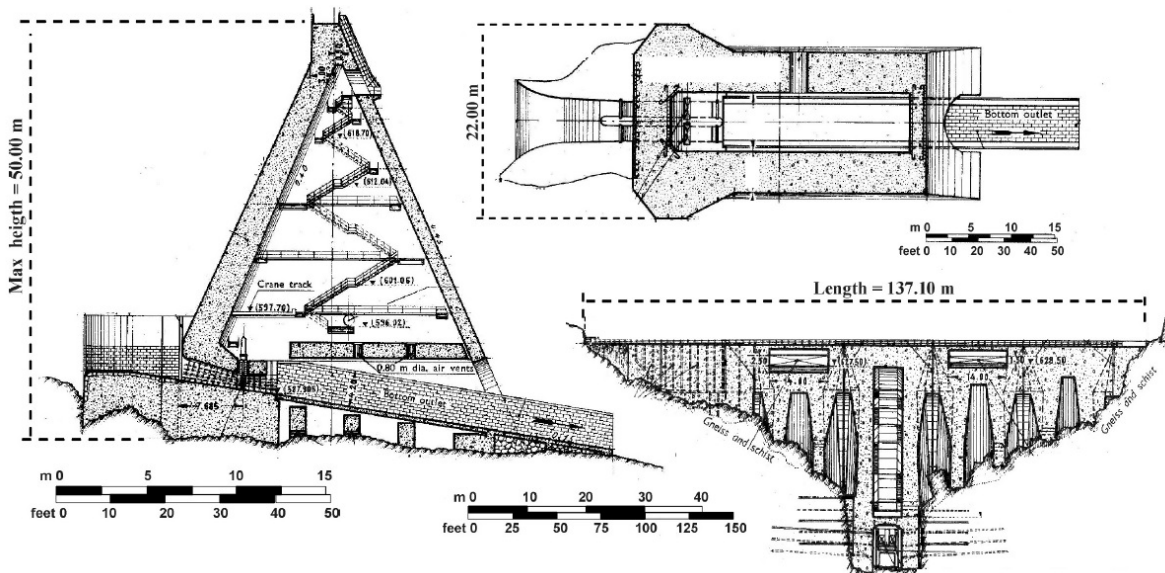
Sectional elevation, cross-section, and horizontal section of the Dam; Donghi, Marcello, and Sainati (2013)
